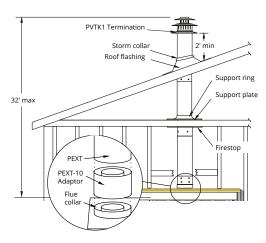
Top vent, roof mounted termination with no offset in vent run.
